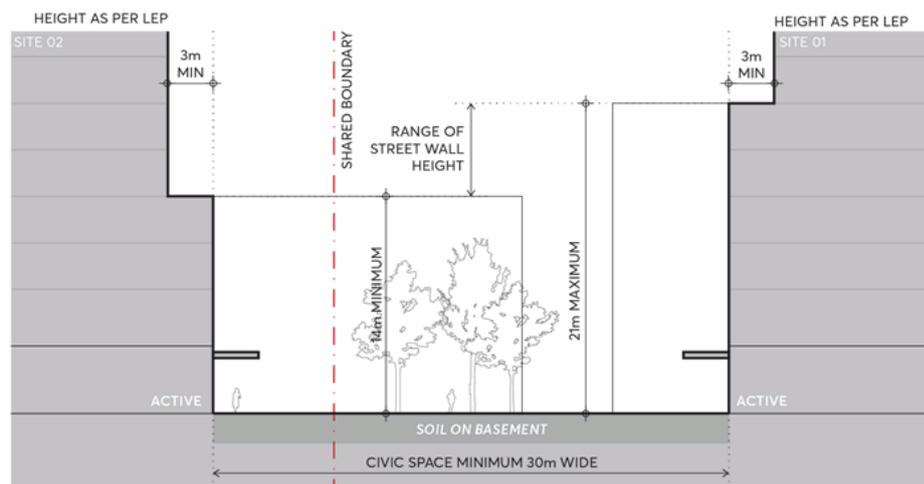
Civic Space (Section K) Setbacks and Street Wall Height
